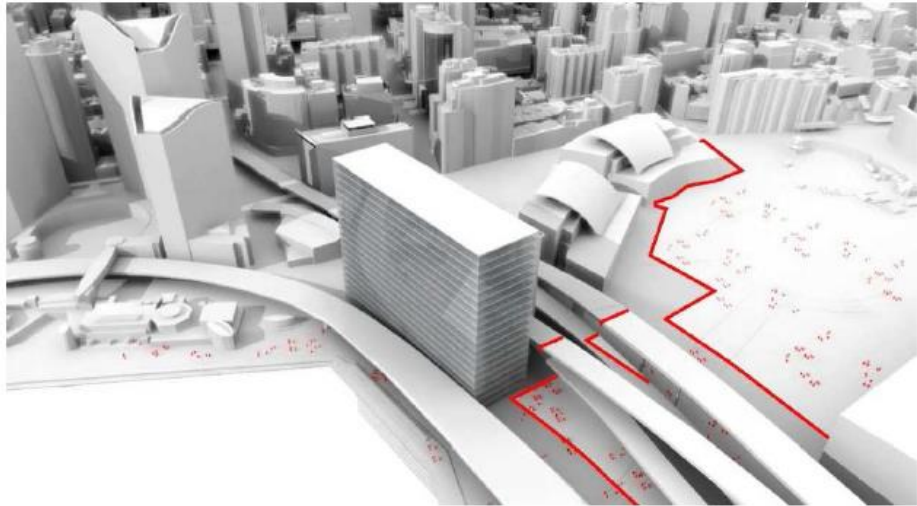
Option 3: Building with large ground floor base and single tower
